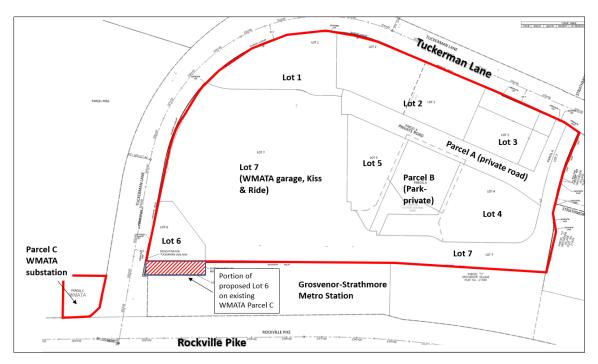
Approved Preliminary Plan, as amended, lotting diagram
